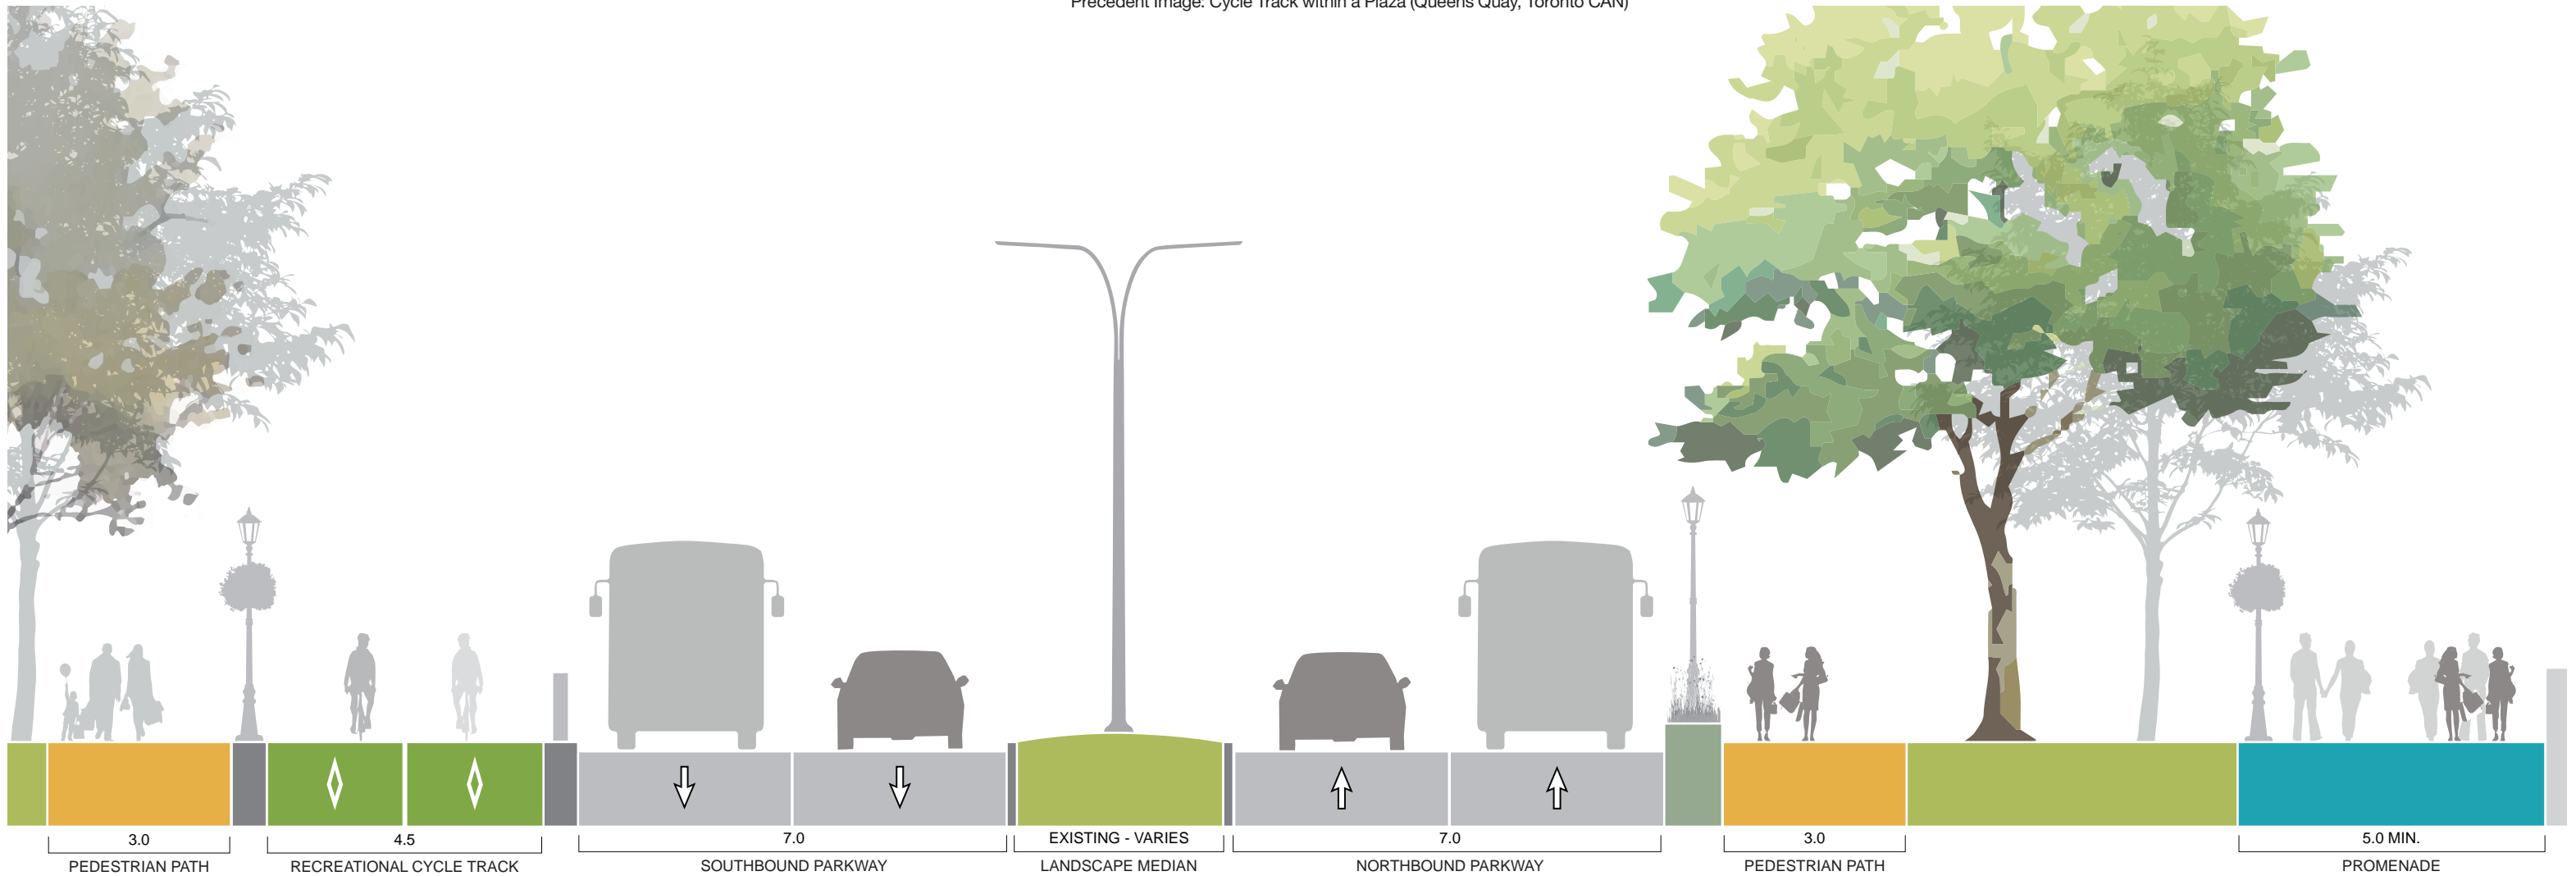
Parkway Section E: Murray to Clifton Hill - looking northward
